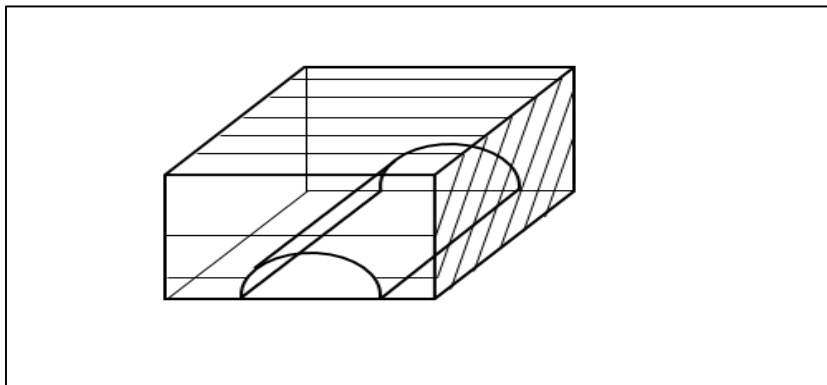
Joint strike parallel to tunnel. Dip 60°; Stress failure at 4.80×10^6 N/m²
